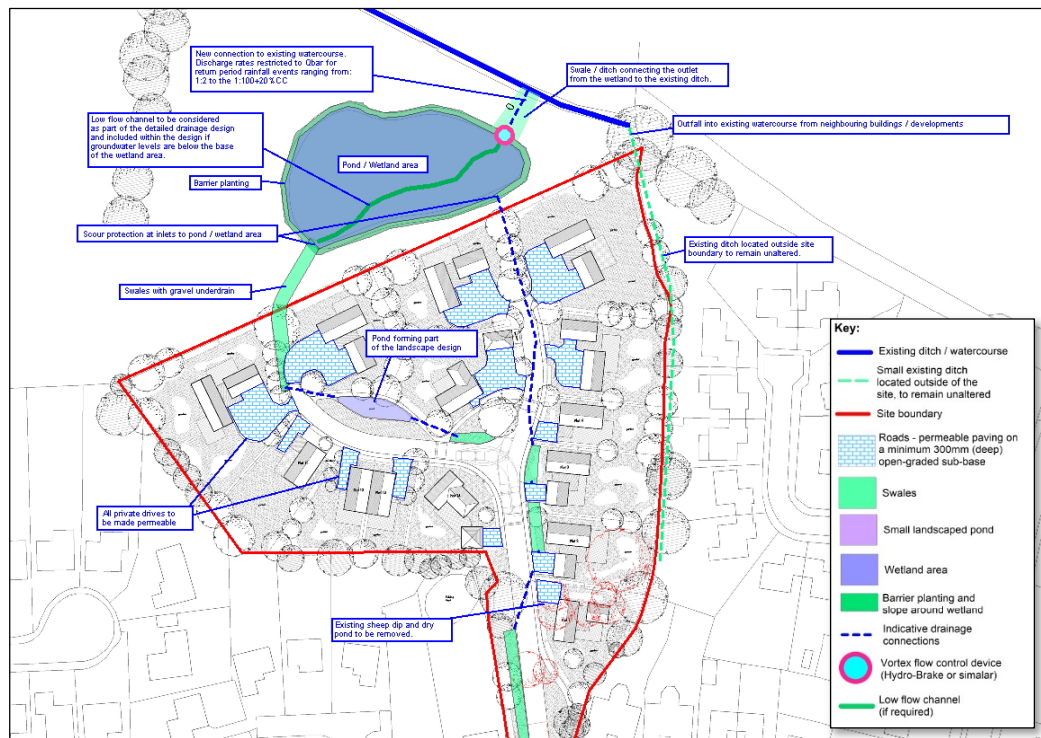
Indicative drainage layout plan showing the proposed location of SuDS.
